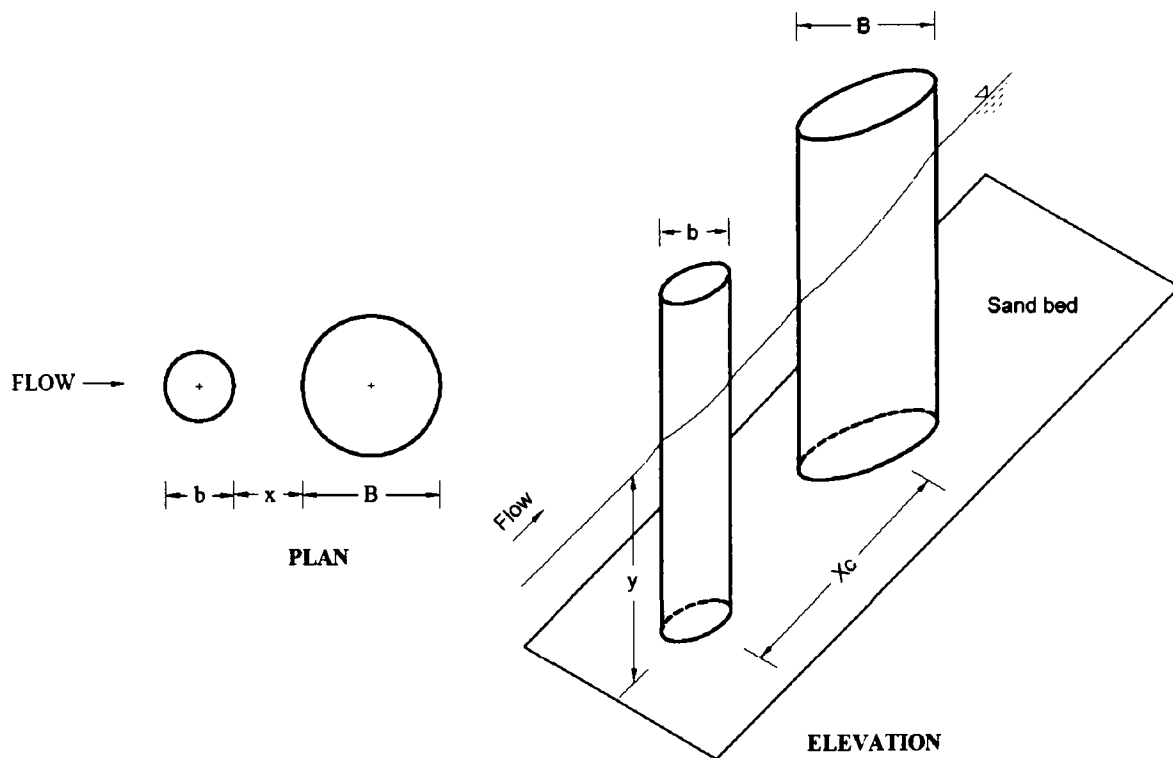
Two piers of different size in tandem arrangement (small size pier at front)
